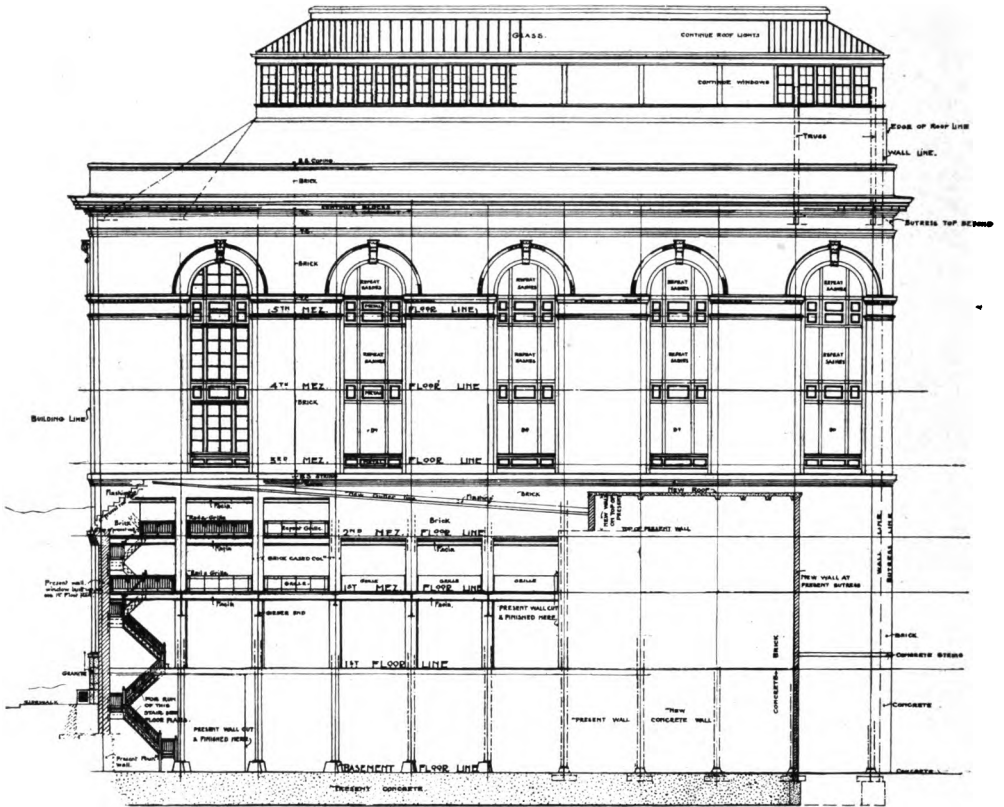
North Elevation and Section where New Building Joins Old, Williamsburg Station.
